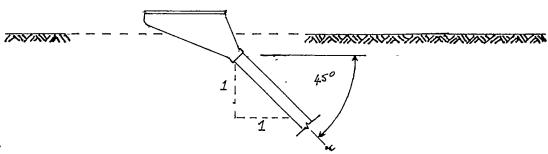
Latrine construction - casting pit cover, honeycomb brick work and pipe lay out:
